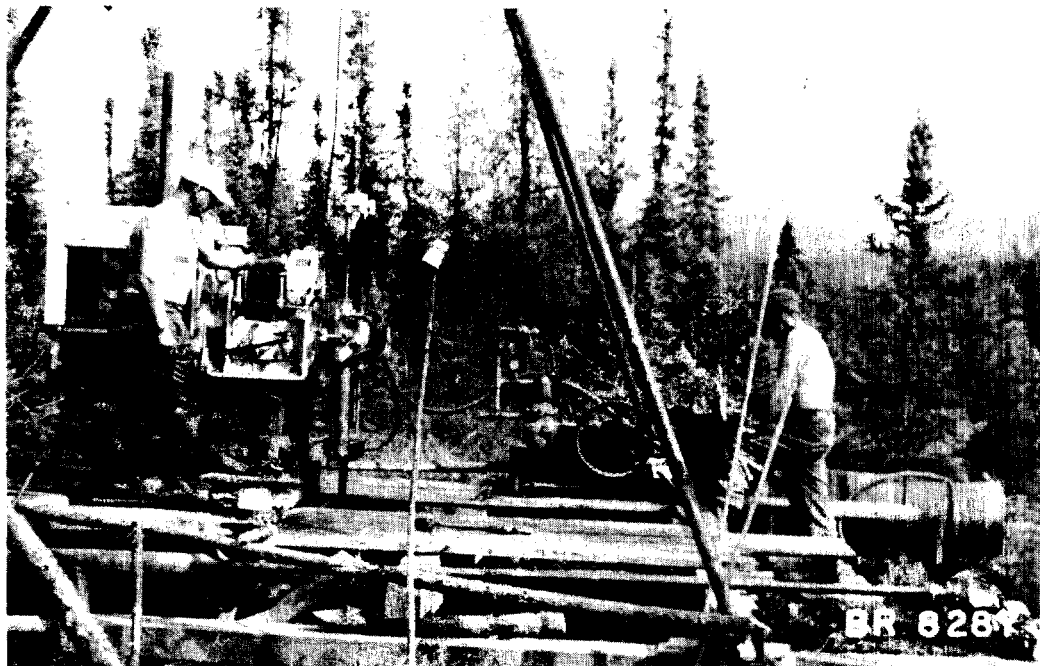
Drilling at borehole NWB 14. Photo taken looking north. General layout of drilling equipment - drill, water pump and water supply tank.
